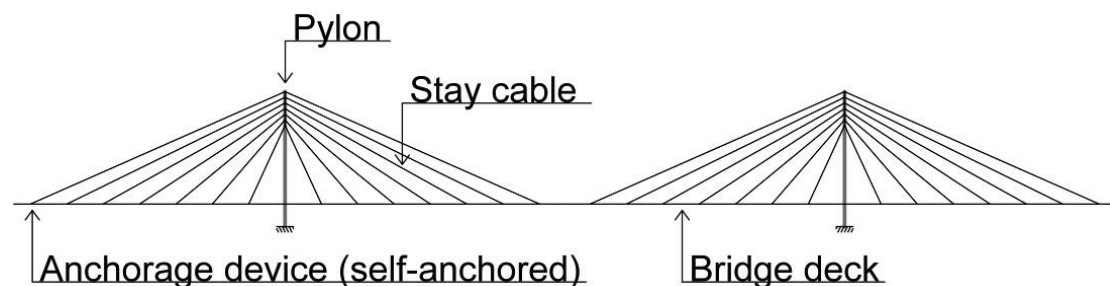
Typical design of a cable-stayed bridge and its main structural elements.
